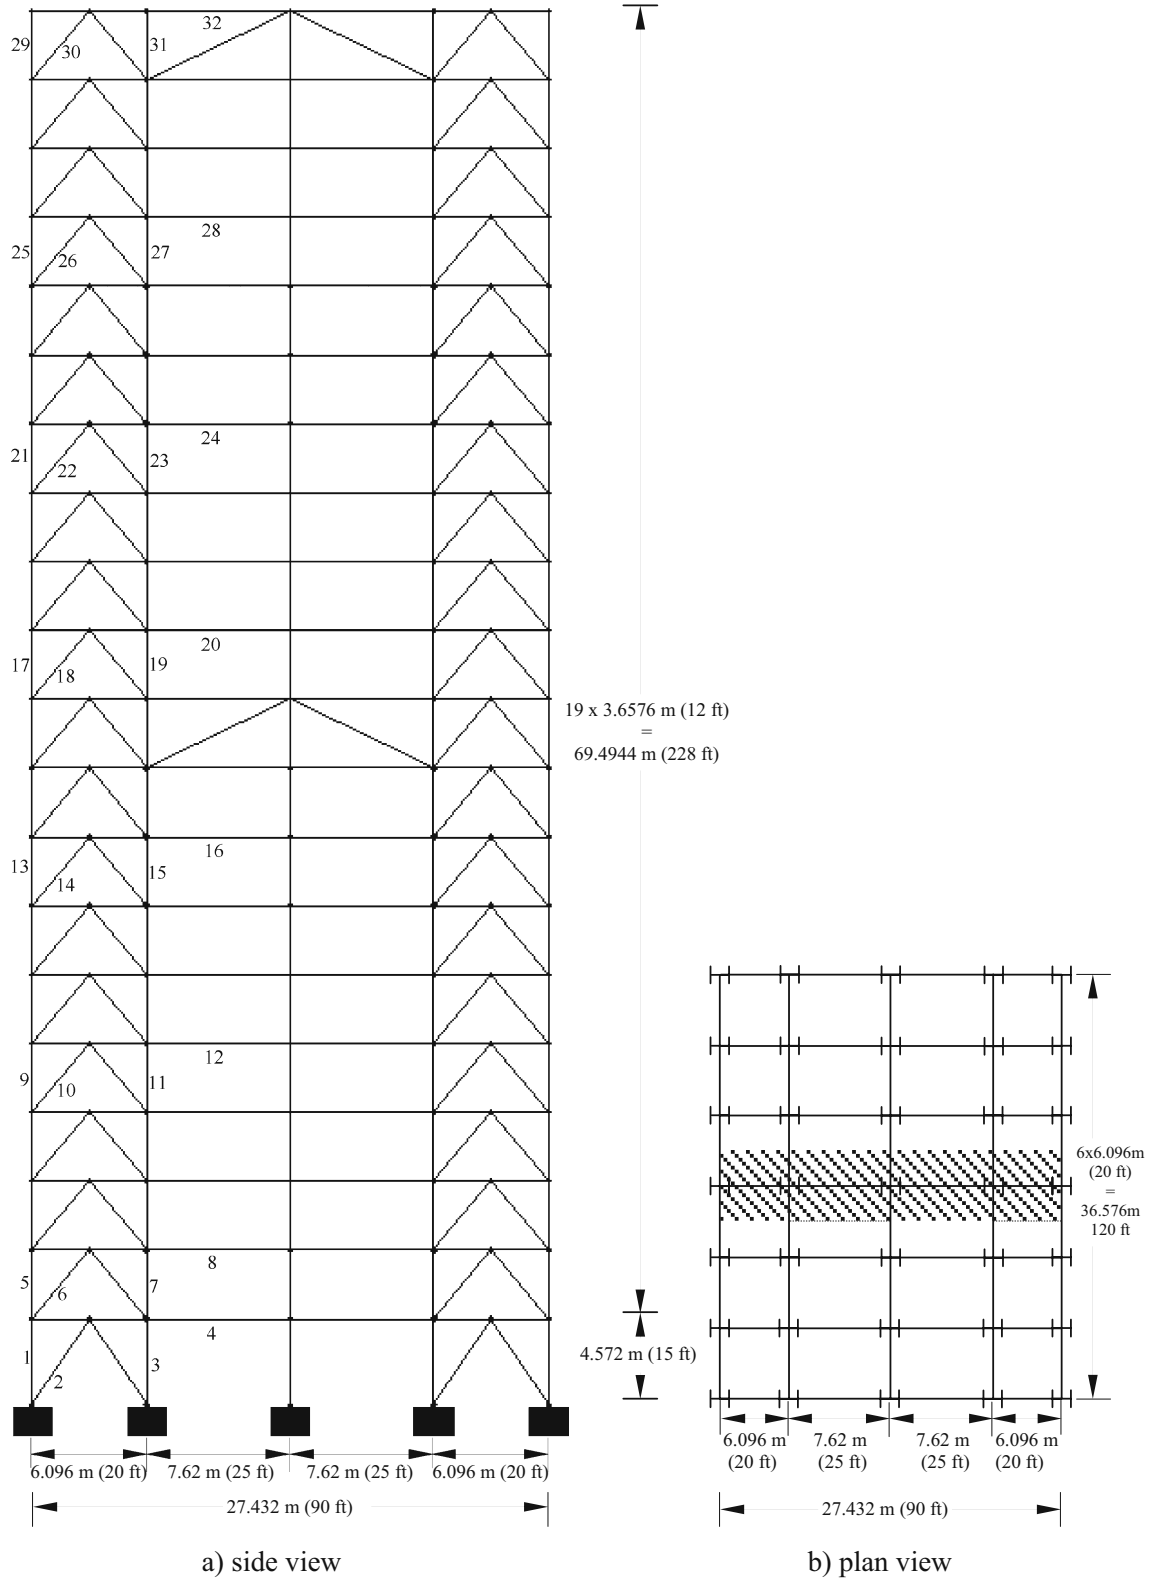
304-member braced planar steel frame a side view, b plan view
